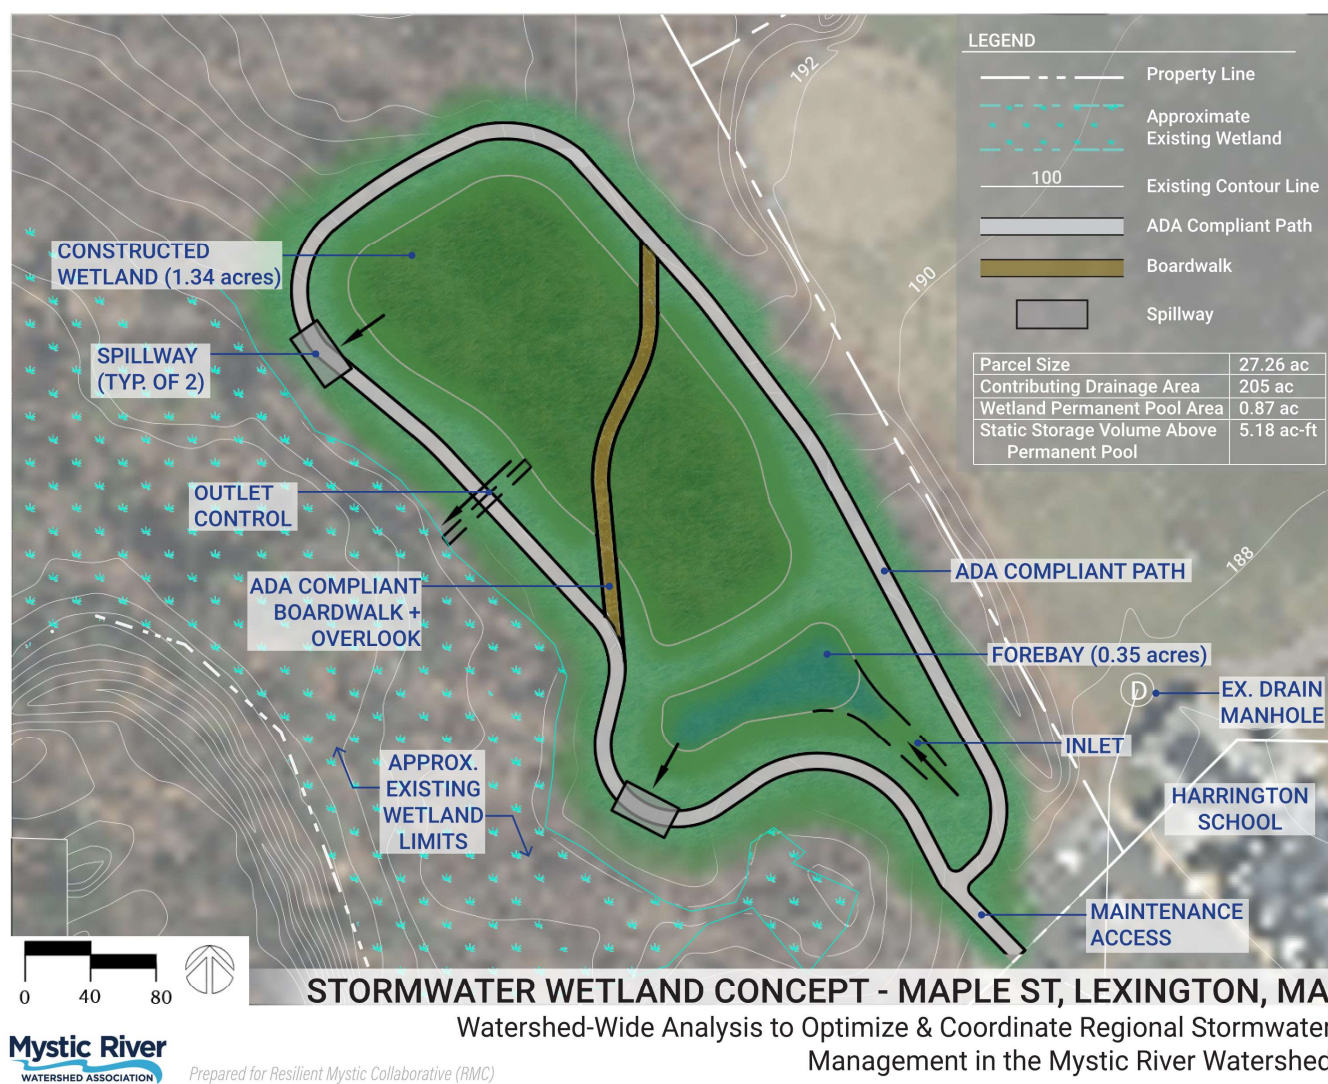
Conceptual Design layout for Maple St. Site (Lexington)
